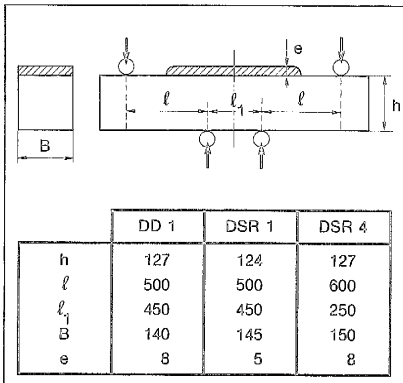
Four point bending tests : specimen dimensions (in mm).
